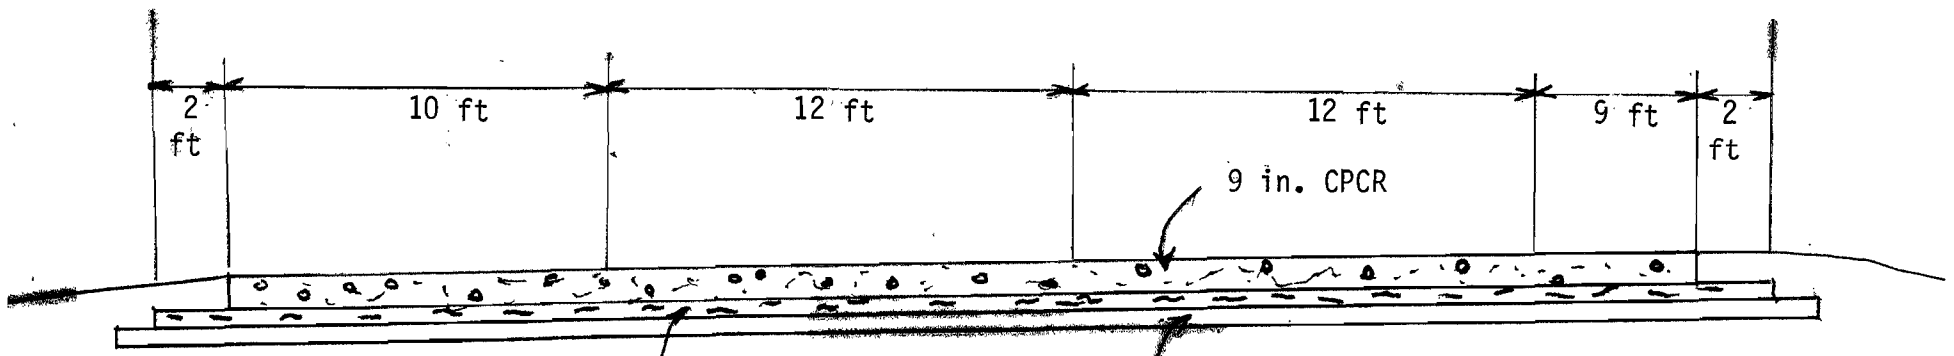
Typical Section of US 87 Near San Antonio, TX (Test Site No. 13)
